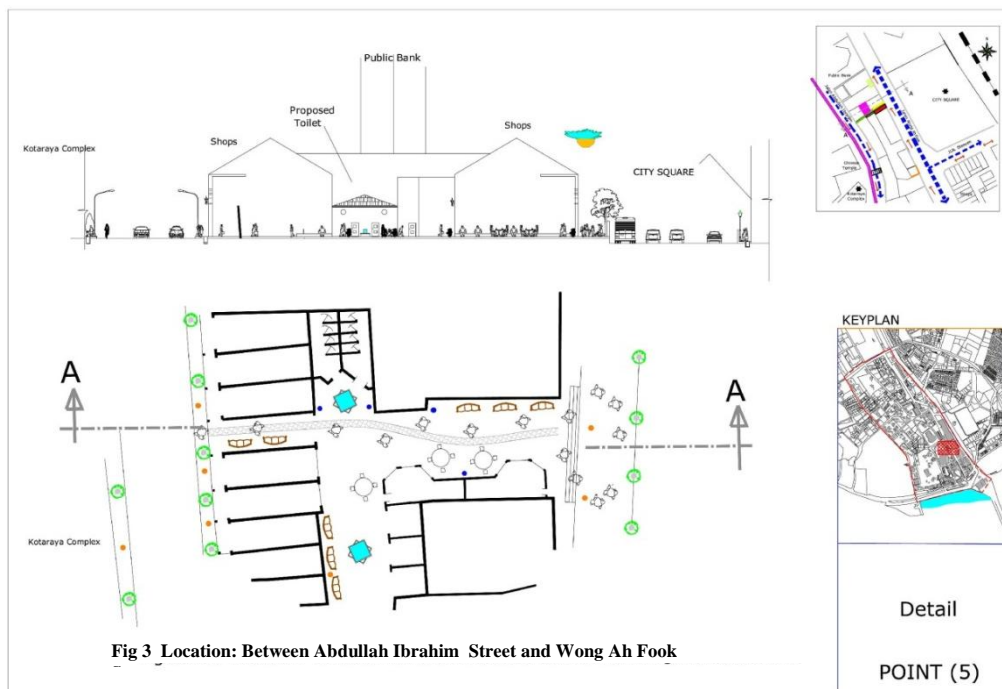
Location: Between Abdullah Ibrahim Street and Wong Ah Fook
